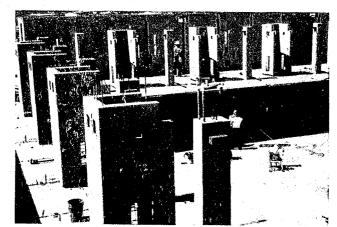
A precast beam-column frame with hollow-core deck members. Spans of up to 45 ft are common.
